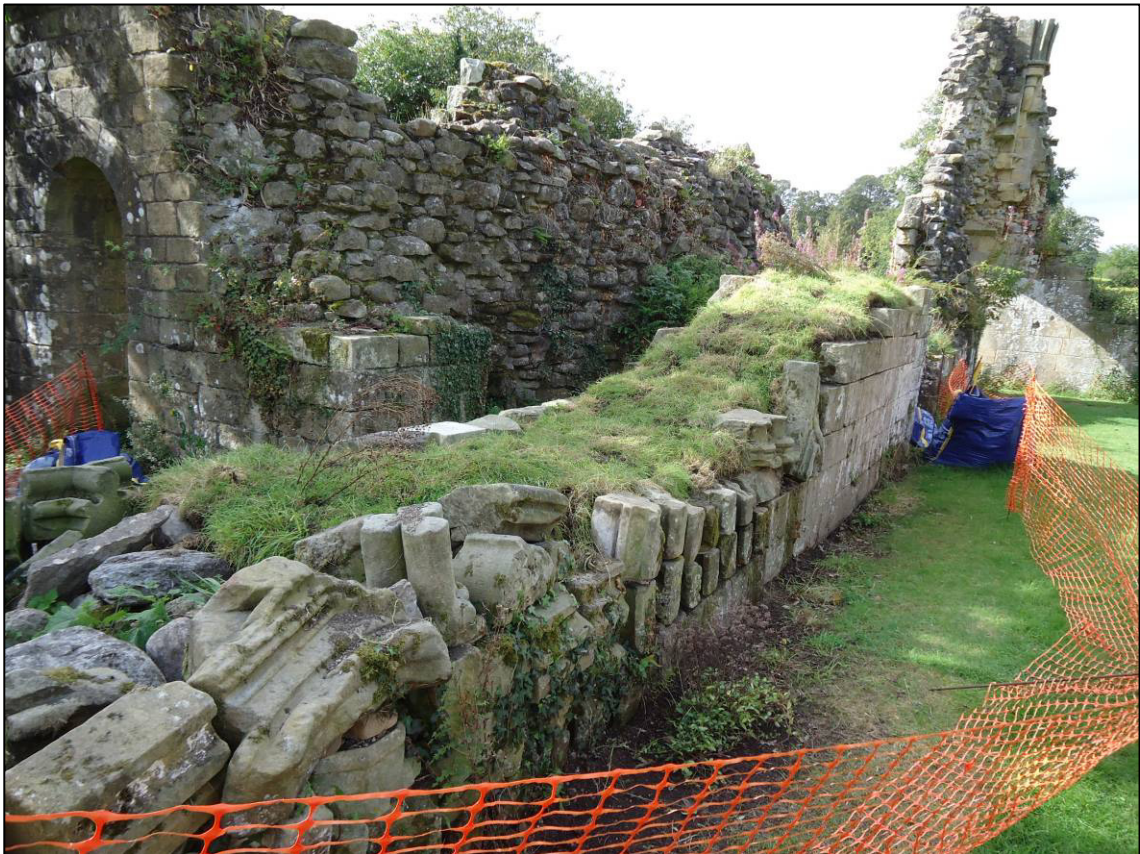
Area 18: Abbey church, lay brothers' quire, north internal elevation of south wall (west part), after repair, looking SW (photograph courtesy Peter Pace).
